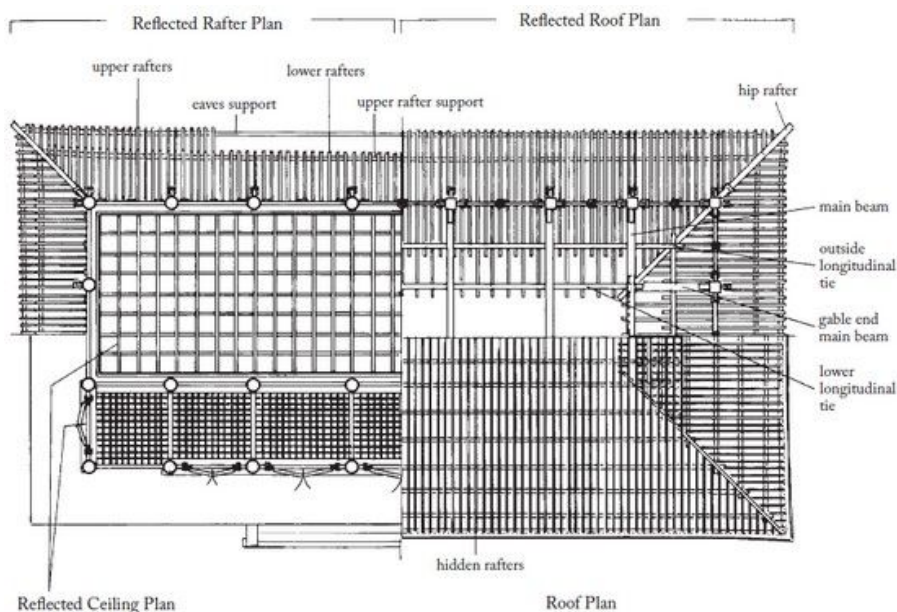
The reflected ceiling, rafter, and roof plans of Sanzō-in Picture Hall.
